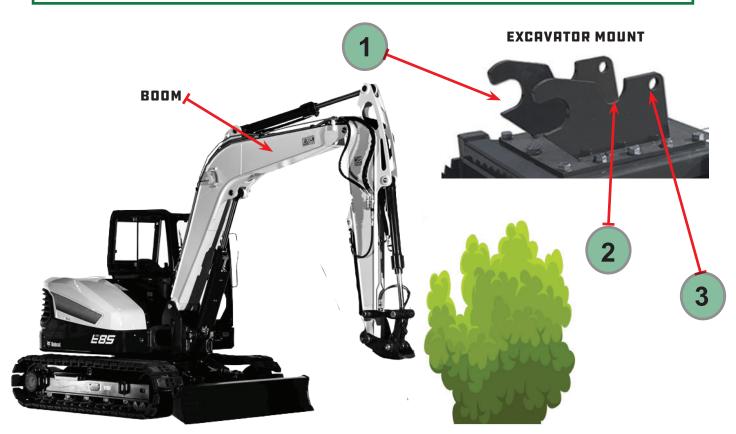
A - EXCAVATOR QUICK ATTACH COUPLER TO EXCAVATOR MOUNT
